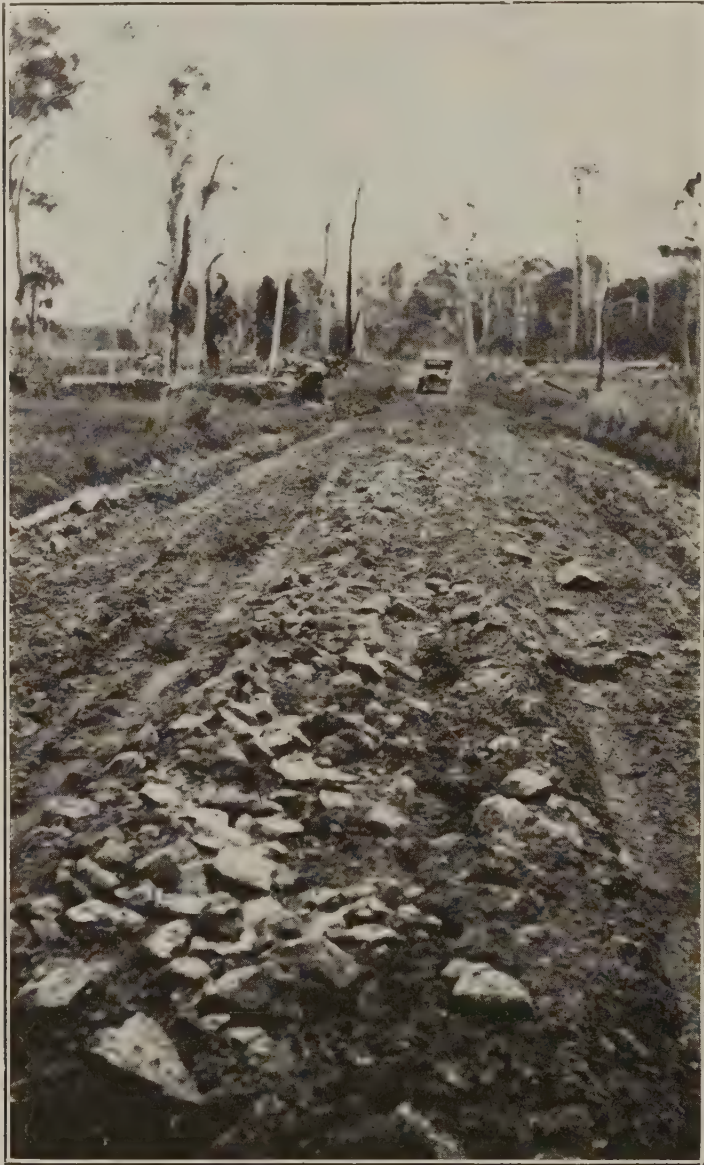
SHOWING ONE METHOD OF ROAD CONSTRUCTION
